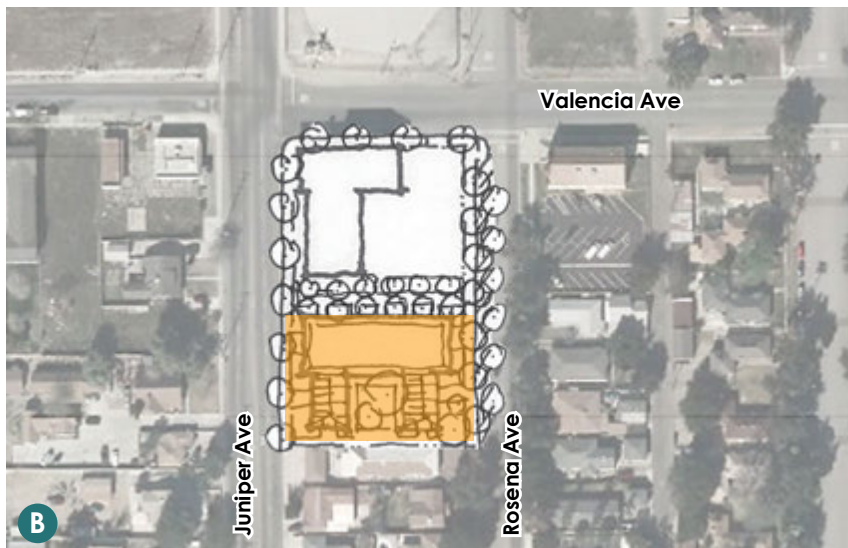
ILLUSTRATIVE SITE PLAN CONCEPT FOR A SMALL INFILL SITE
